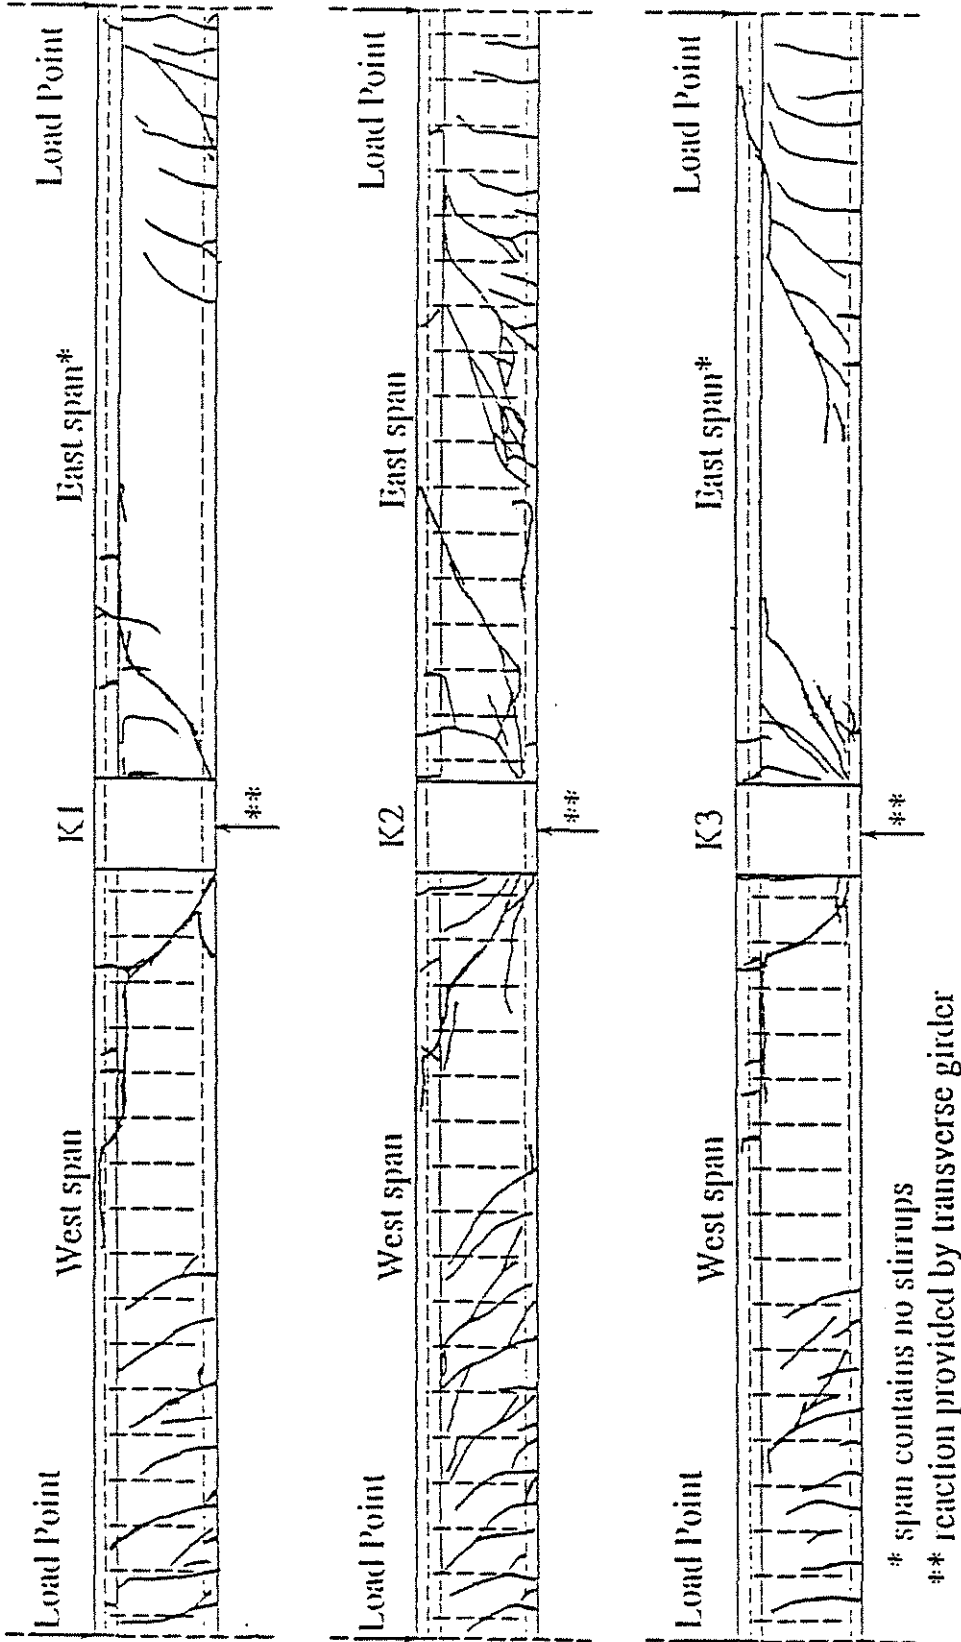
Crack patterns for joist K1, K2 and K3
